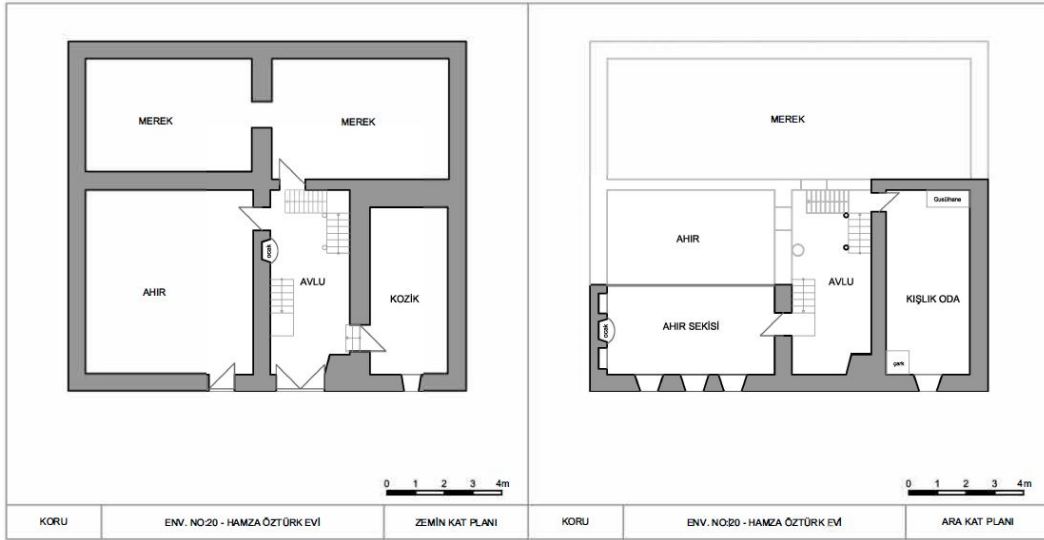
An Example of a Village House Plan Scheme with Stable Mezzanine and Winter Room.
